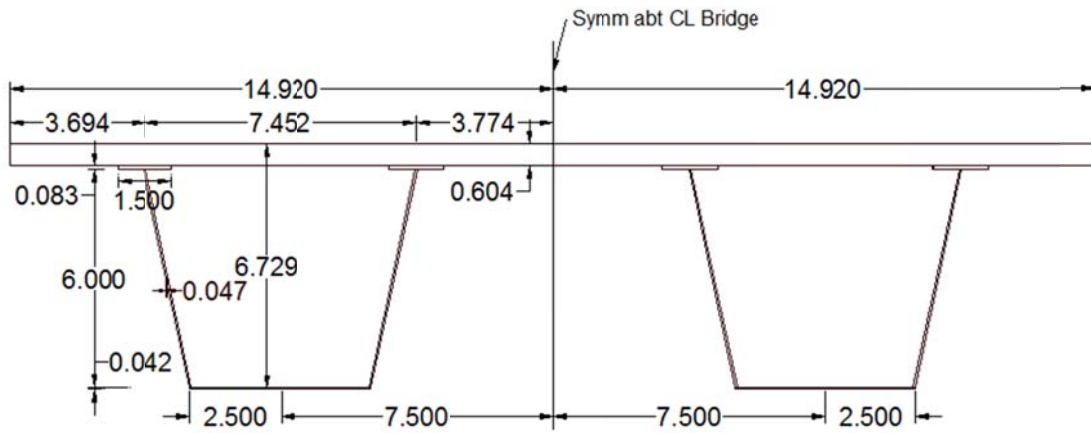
Typical steel BOX cross section (1) for L = 120ft
